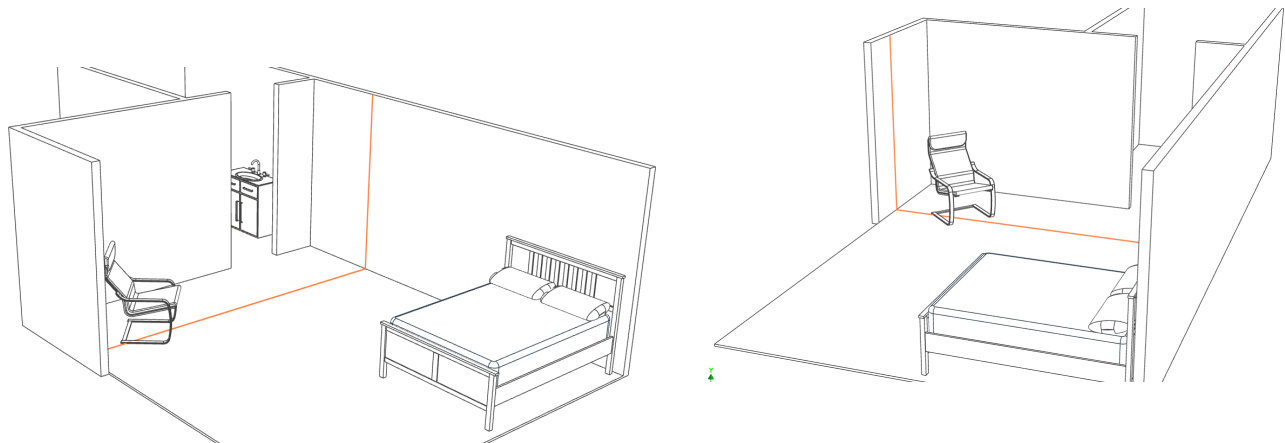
Laser Line Projects Track Path from Wall to Wall
